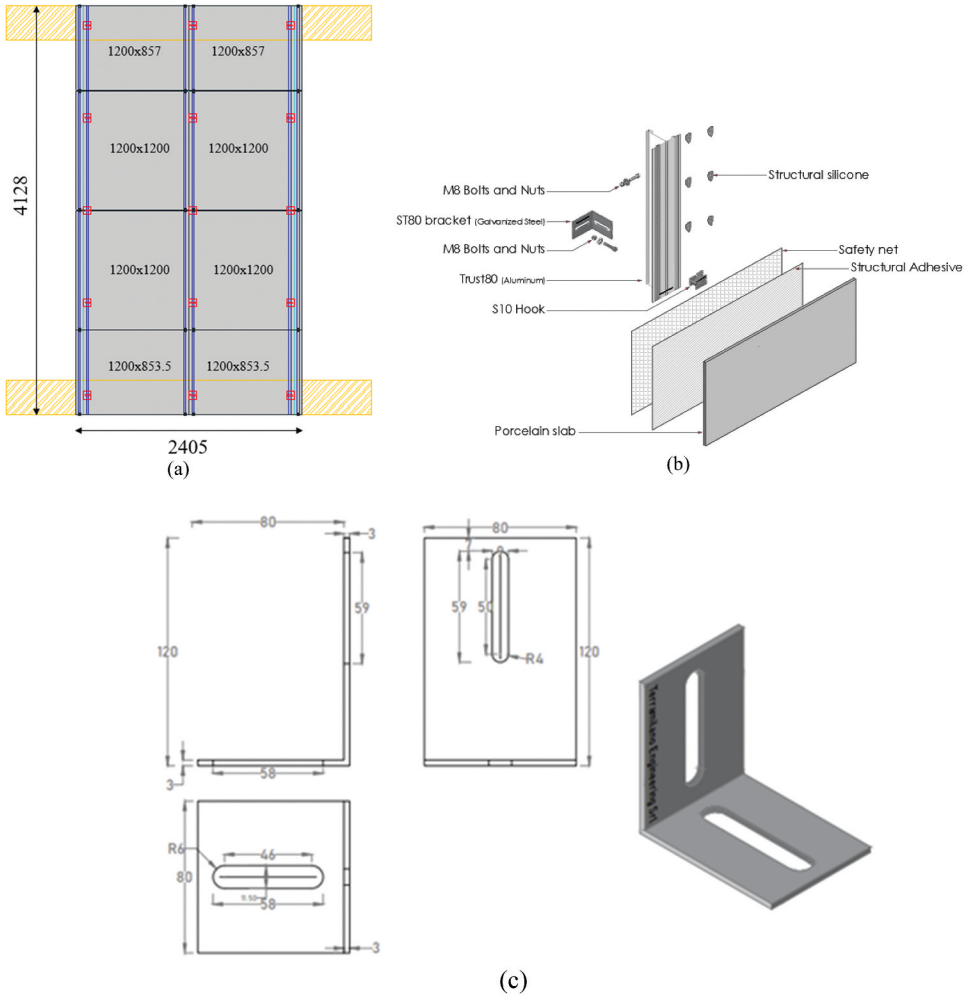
(a) Dimensions of the tested sample, with (b) construction details and (c) particular of L-shaped support brackets (in mm).
